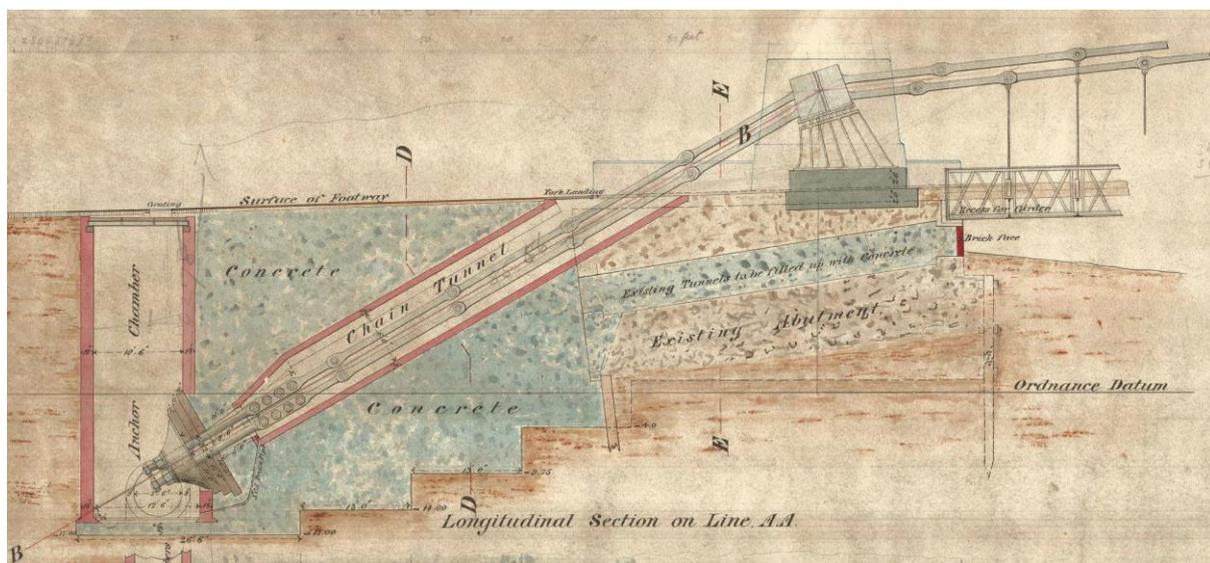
An extract from the historic drawings showing the abutment arrangement. It shows the anchor chain arrangement and proximity of the pedestal foundation to the embankment wall / bridge deck girder seats.
